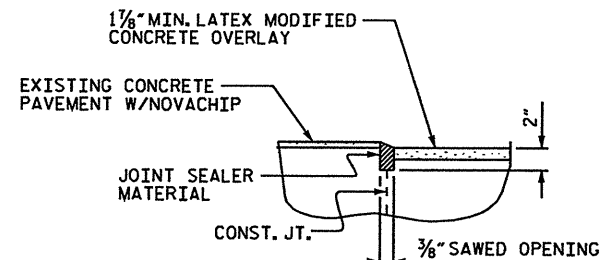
DETAIL FOR LATEX MODIFIED CONCRETE OVERLAY
